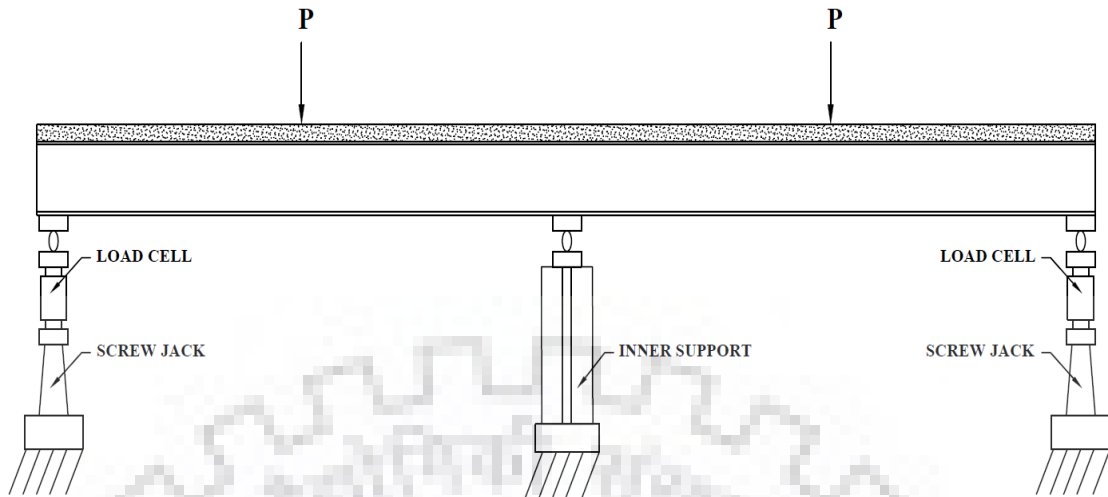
Layout of the test setup (recreated from Jiang et al. 2015)
